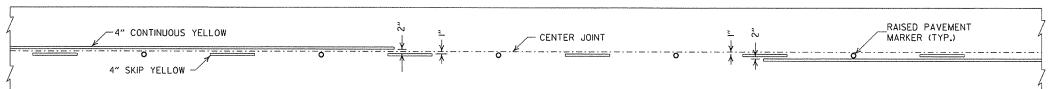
DETAIL OF STANDARD RAISED PAVEMENT MARKERS
